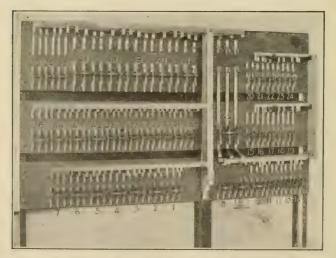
Rear view of interlocking, dead-front, manually-operated stage switch-board showing busbar construction. (Manufactured by *The Pringle Electrical Mfg. Co.* for the Hippodrome Theatre, Buffalo, N. Y.)
